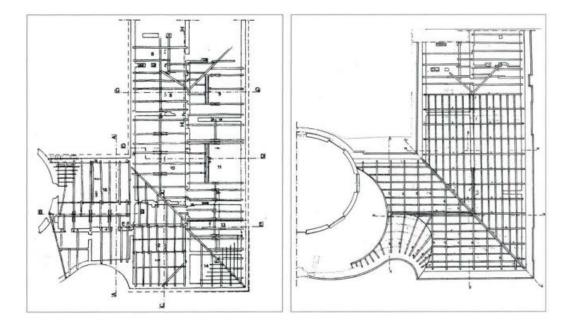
The plan of the dilapidated roof structure and project plan of the new roof structure in laminated wood. Imagine from Palazzo Carignano: pianta di rilievo della structura di copertura fatiscente e pianta diprogetto della nuova struttura di copertura in legno lamellare.
